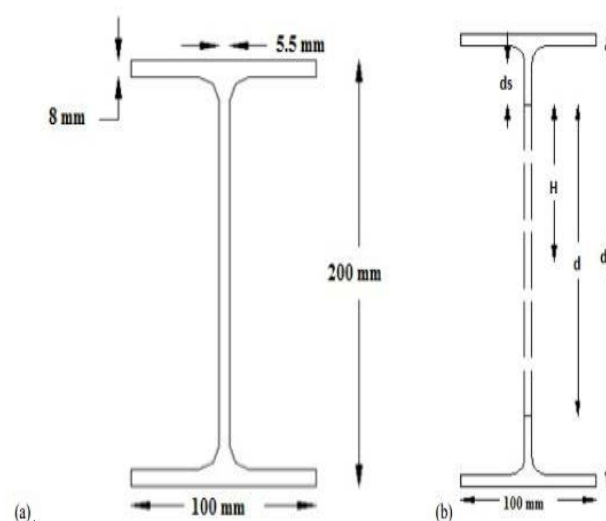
(a)Specimen properties of normal I beam(b)Specimen properties after castellation.
